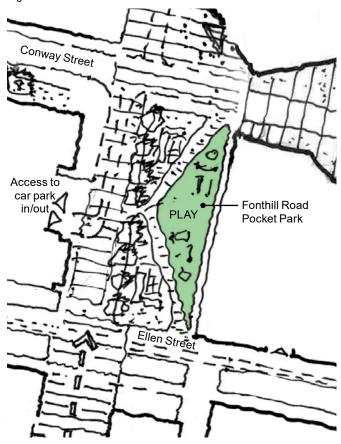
Illustrative sketch plan of the Pocket Park.
